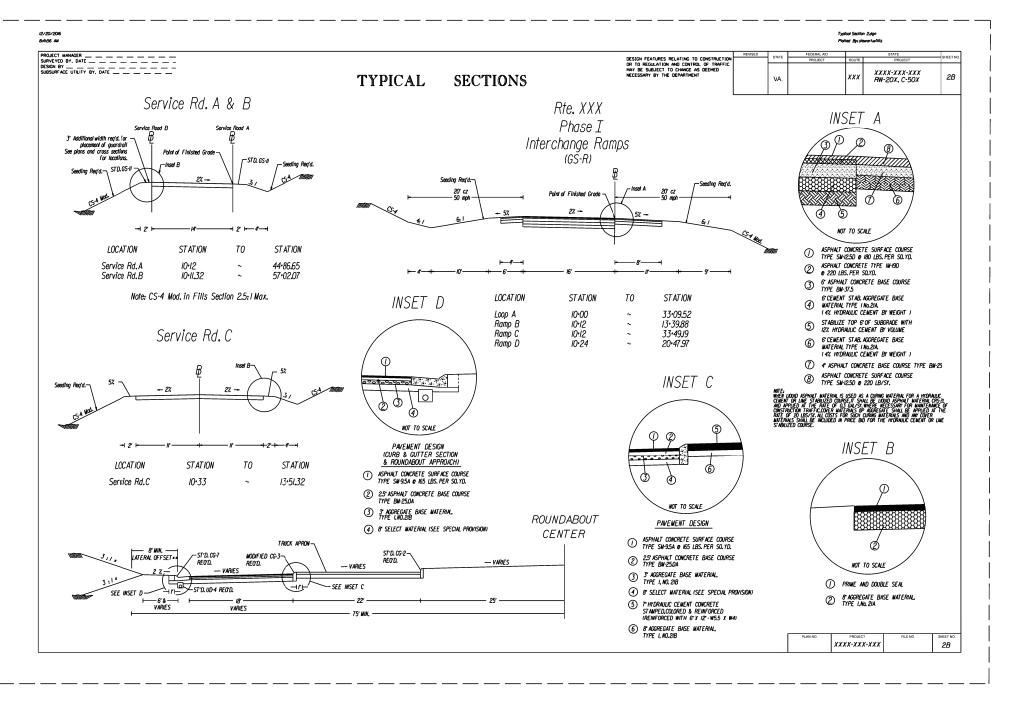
H - 17 SAMPLE TYPICAL SECTION SHEET
